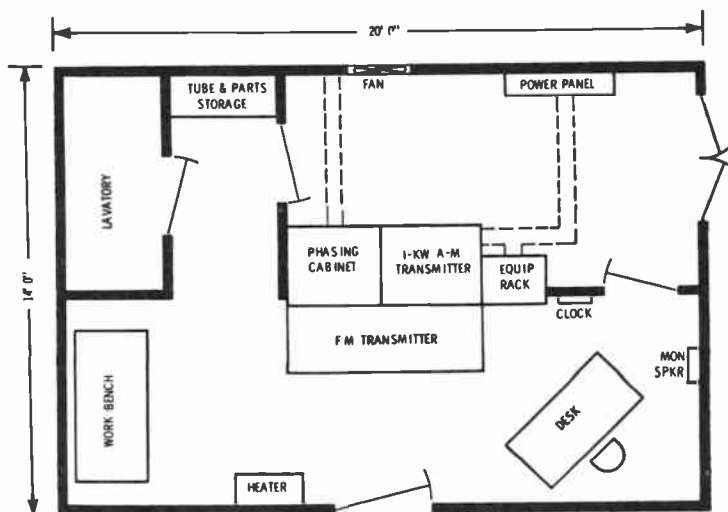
Transmitter floor plan and equipment arrangement.
